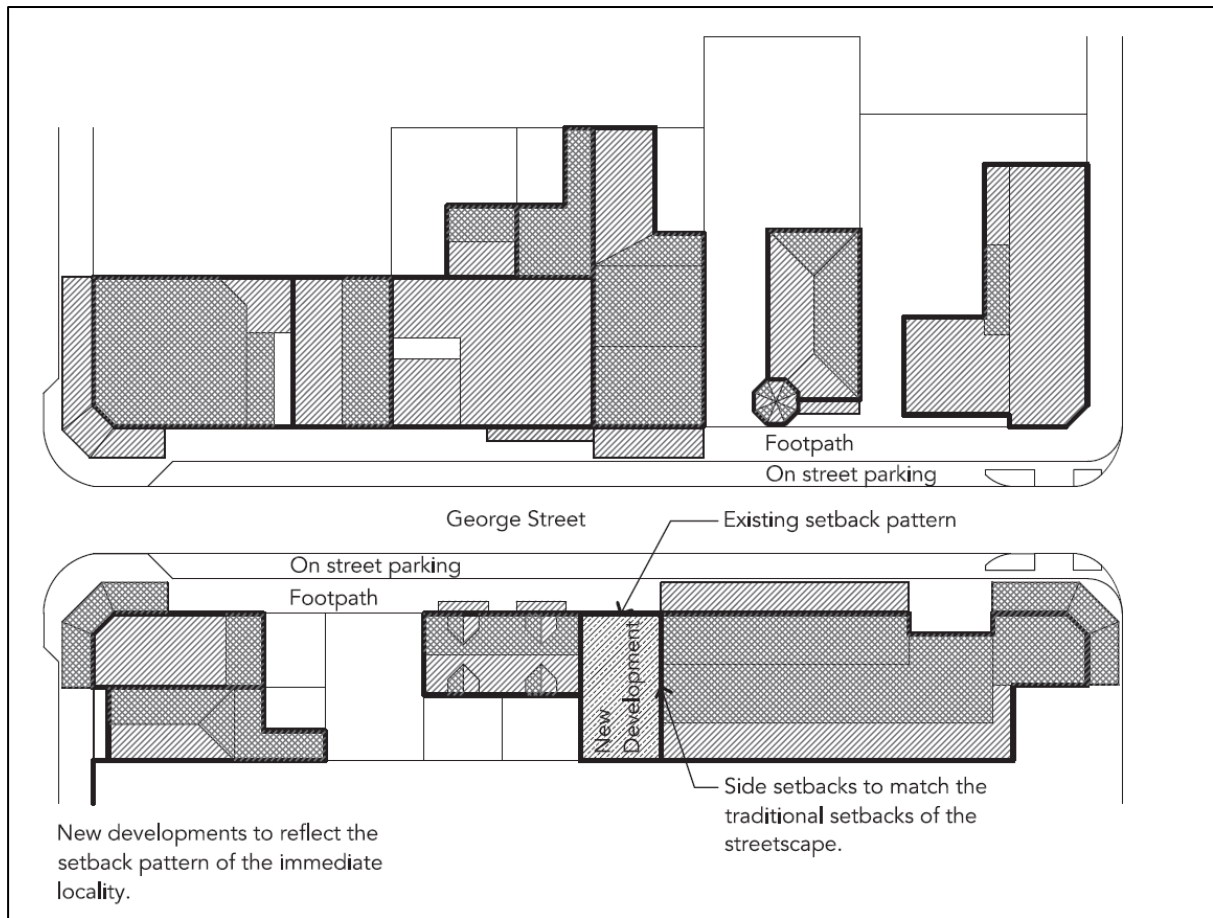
Site plan illustrating existing setback patterns and compatible new development.
